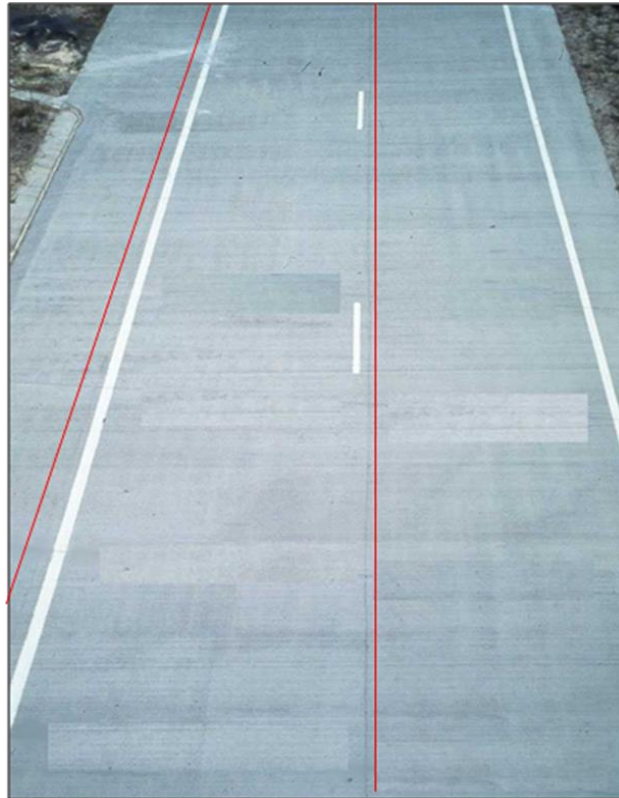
Two-lane carriageway with concrete shoulder and locations of longitudinal joints for widened truck lane shown.
